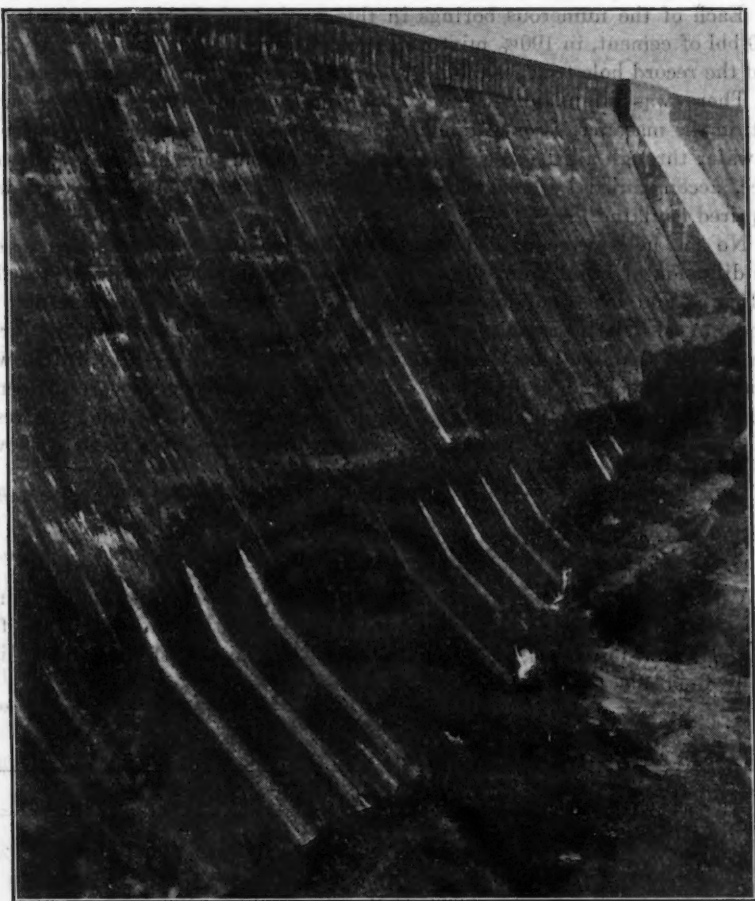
THOKERWADI DAM, BEFORE CEMENTATION.
